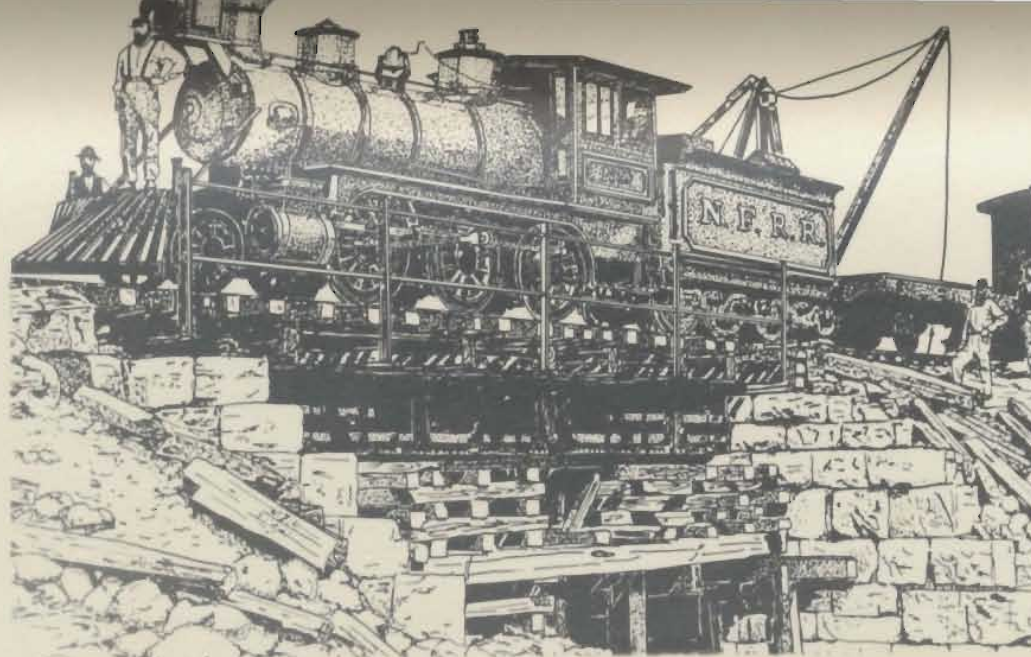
Work train and crew constructing a bridge (small trestle). Note the stone work typical of bridges and trestles built by Reid.
